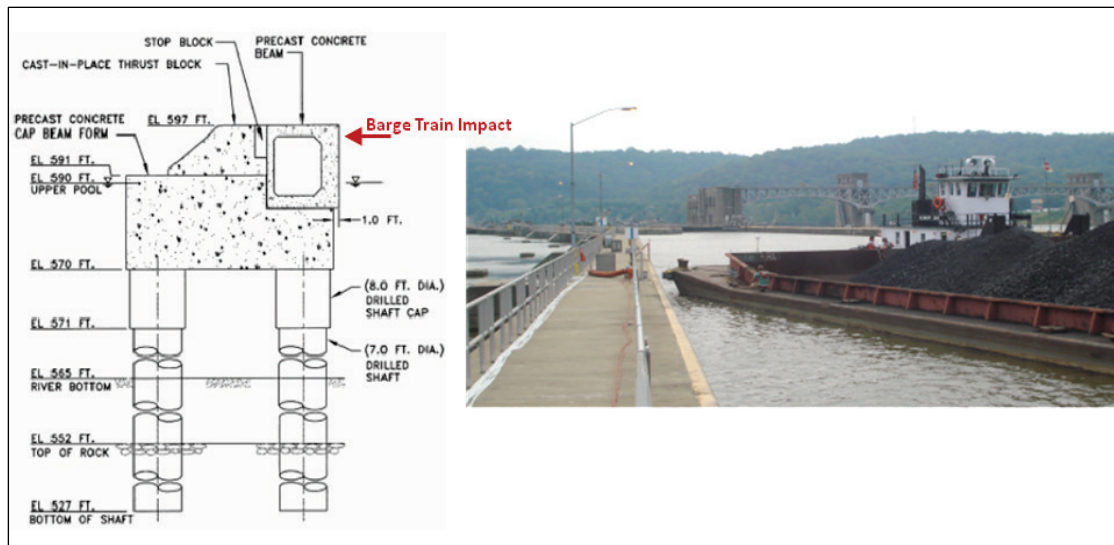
A set of two-DIP bents at Marmet approach wall to be used to support impact beam sections.
